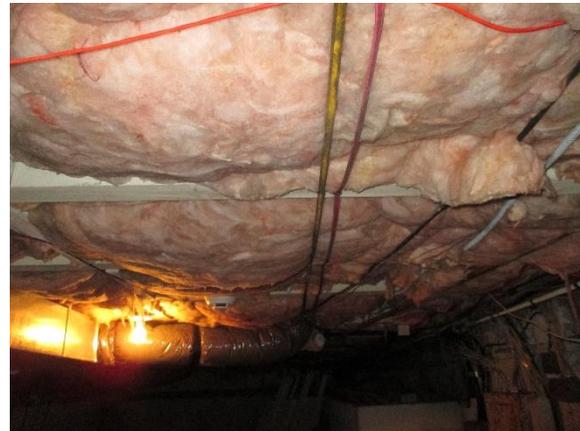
Insulation, wires, ductwork, and conduit obscure the visibility of floor beams in the basement.
